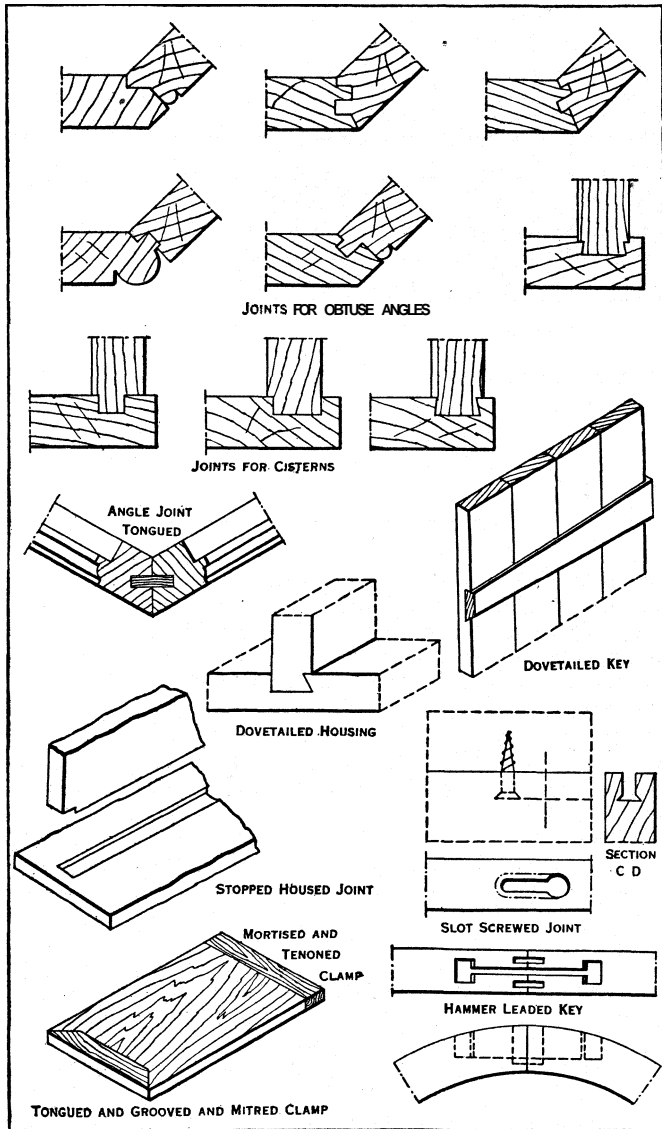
JOINERY JOINTS USED FOR SPECIAL PURPOSES
